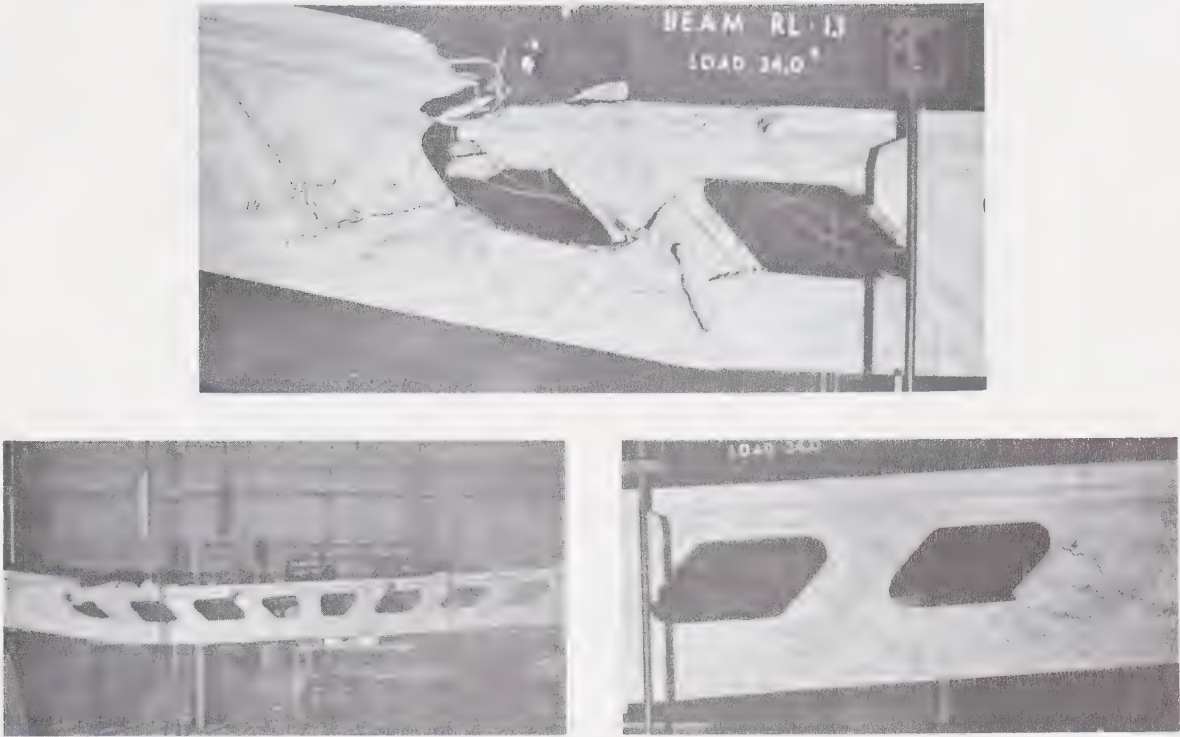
CRACKING AND FAILURE PATTERN OF BEAM 13-16-6-P
